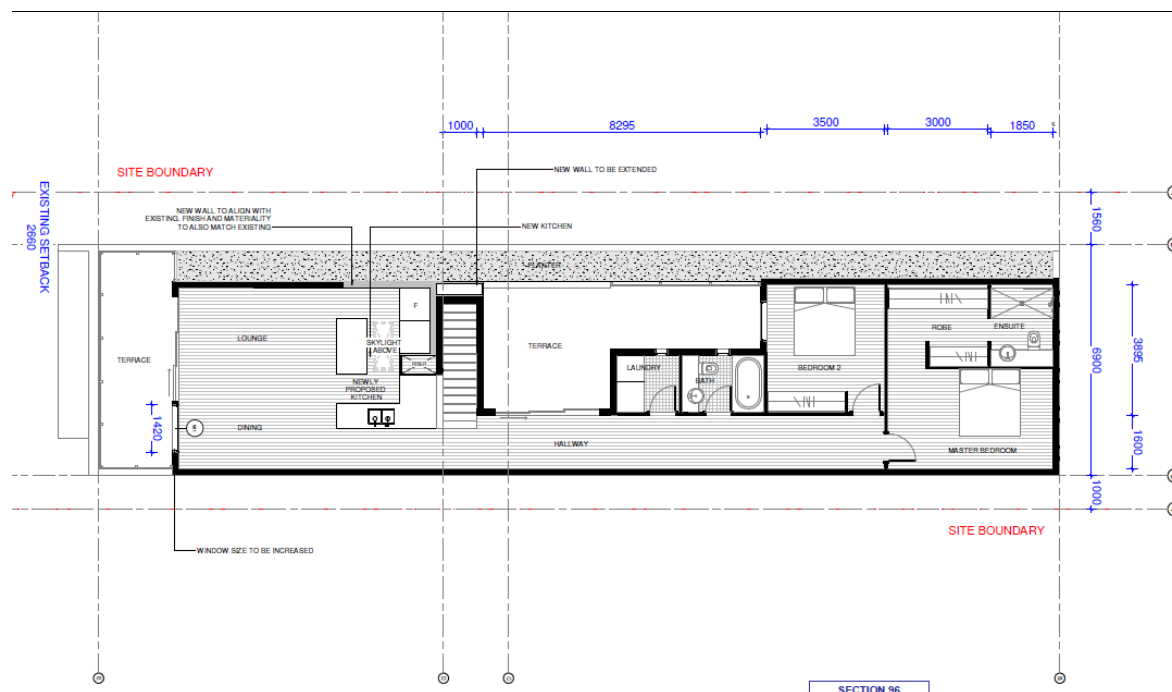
Proposed modified layout - Upper Floor Apartment 7
